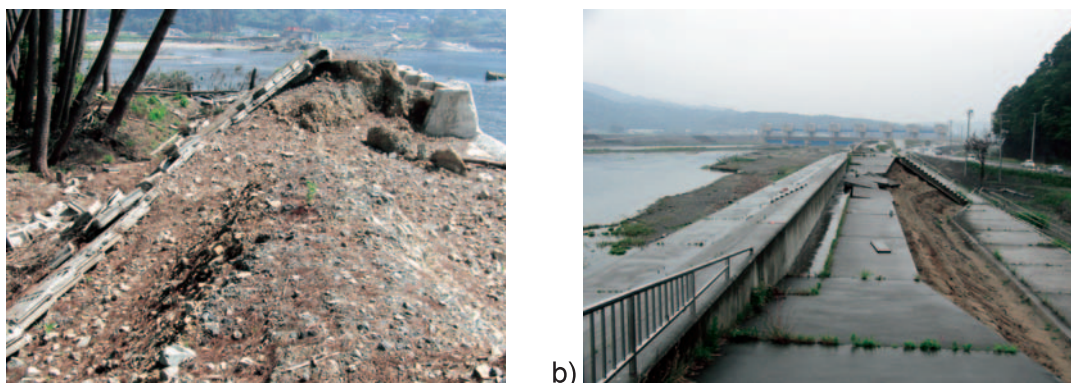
Embankment-type coastal dikes; the concrete slab at the crest and the top concrete panel on the downstream slope were lifted up and washed away followed by the start of erosion of the backfill caused by over-flow of tsunami; a) Koshikiri, Sanriku-cho, Ohunato City; and b) Tsugaruishi, Miyako-minami (note: the full-section of dike was lost at sections close to these sites) (Tatsuoka, F.)
